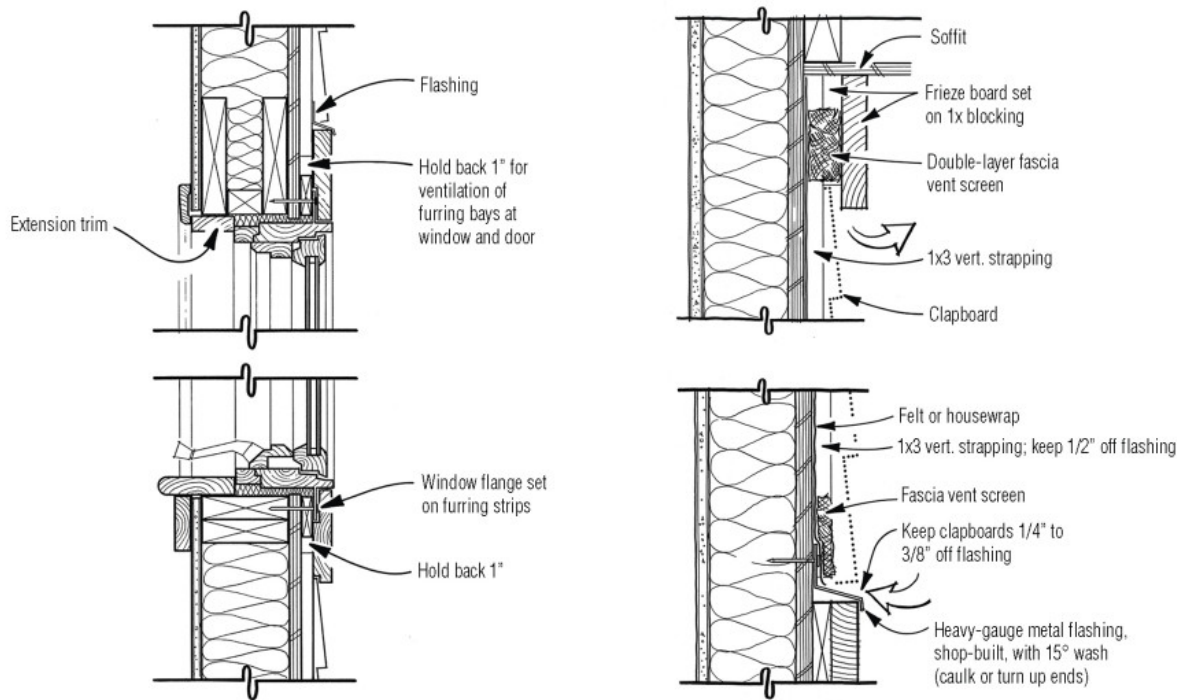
FIGURE B: DRAINAGE PLANE FOR BOARD SIDING
